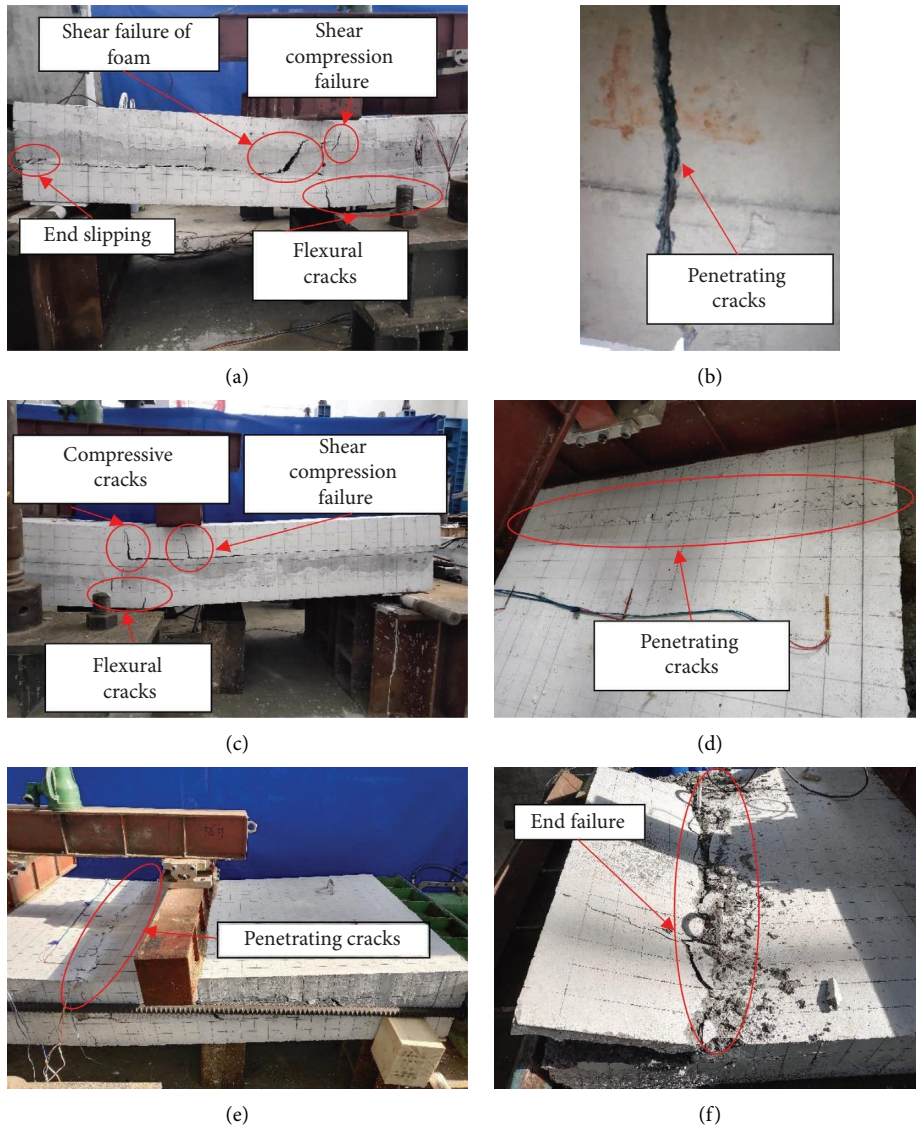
Failure modes of tested Sandwich wall panels. (a) Side view of specimen G24-I, (b) back of bottom wythe of specimen G24-I, (c) side view of specimen G24-II, and (d) vertical view of top wythe of specimen G24-I, (e) specimen G24A0.2-I, and (f) specimen G24A0.4-I.
